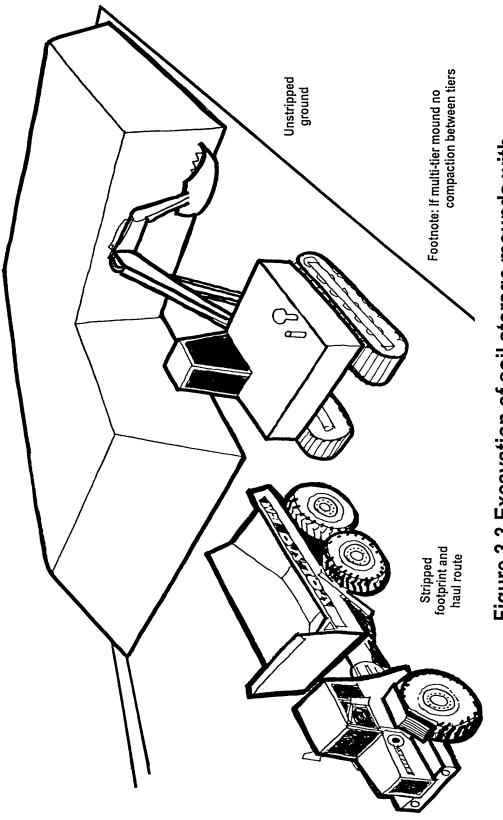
Excavation of soil storage mounds with front loading shovels and dump trucks: Single and multi-tier mounds
